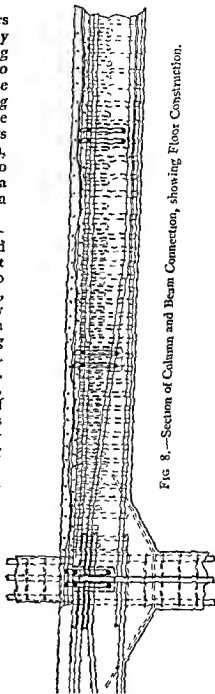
Section of Column and Beam Connection, showing Floor Construction.
